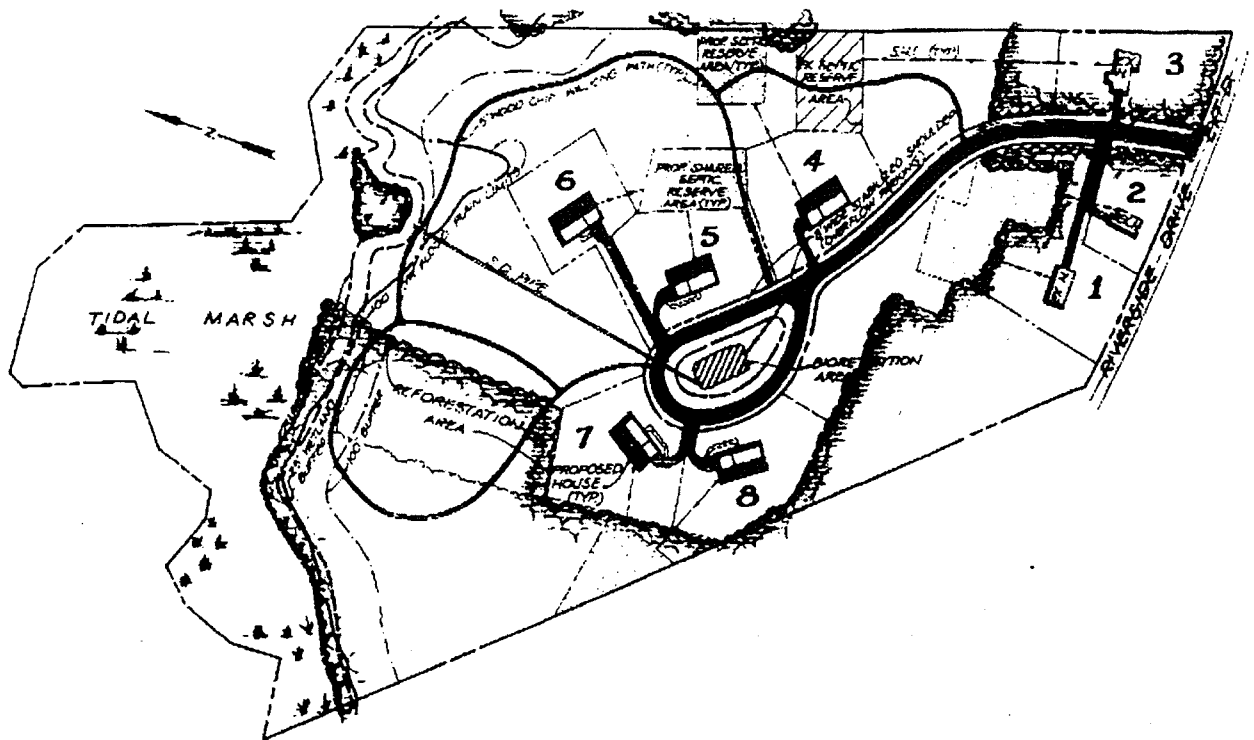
The Open Space Subdivision That Could Have Been Built at Duck Crossing (eight lots)
